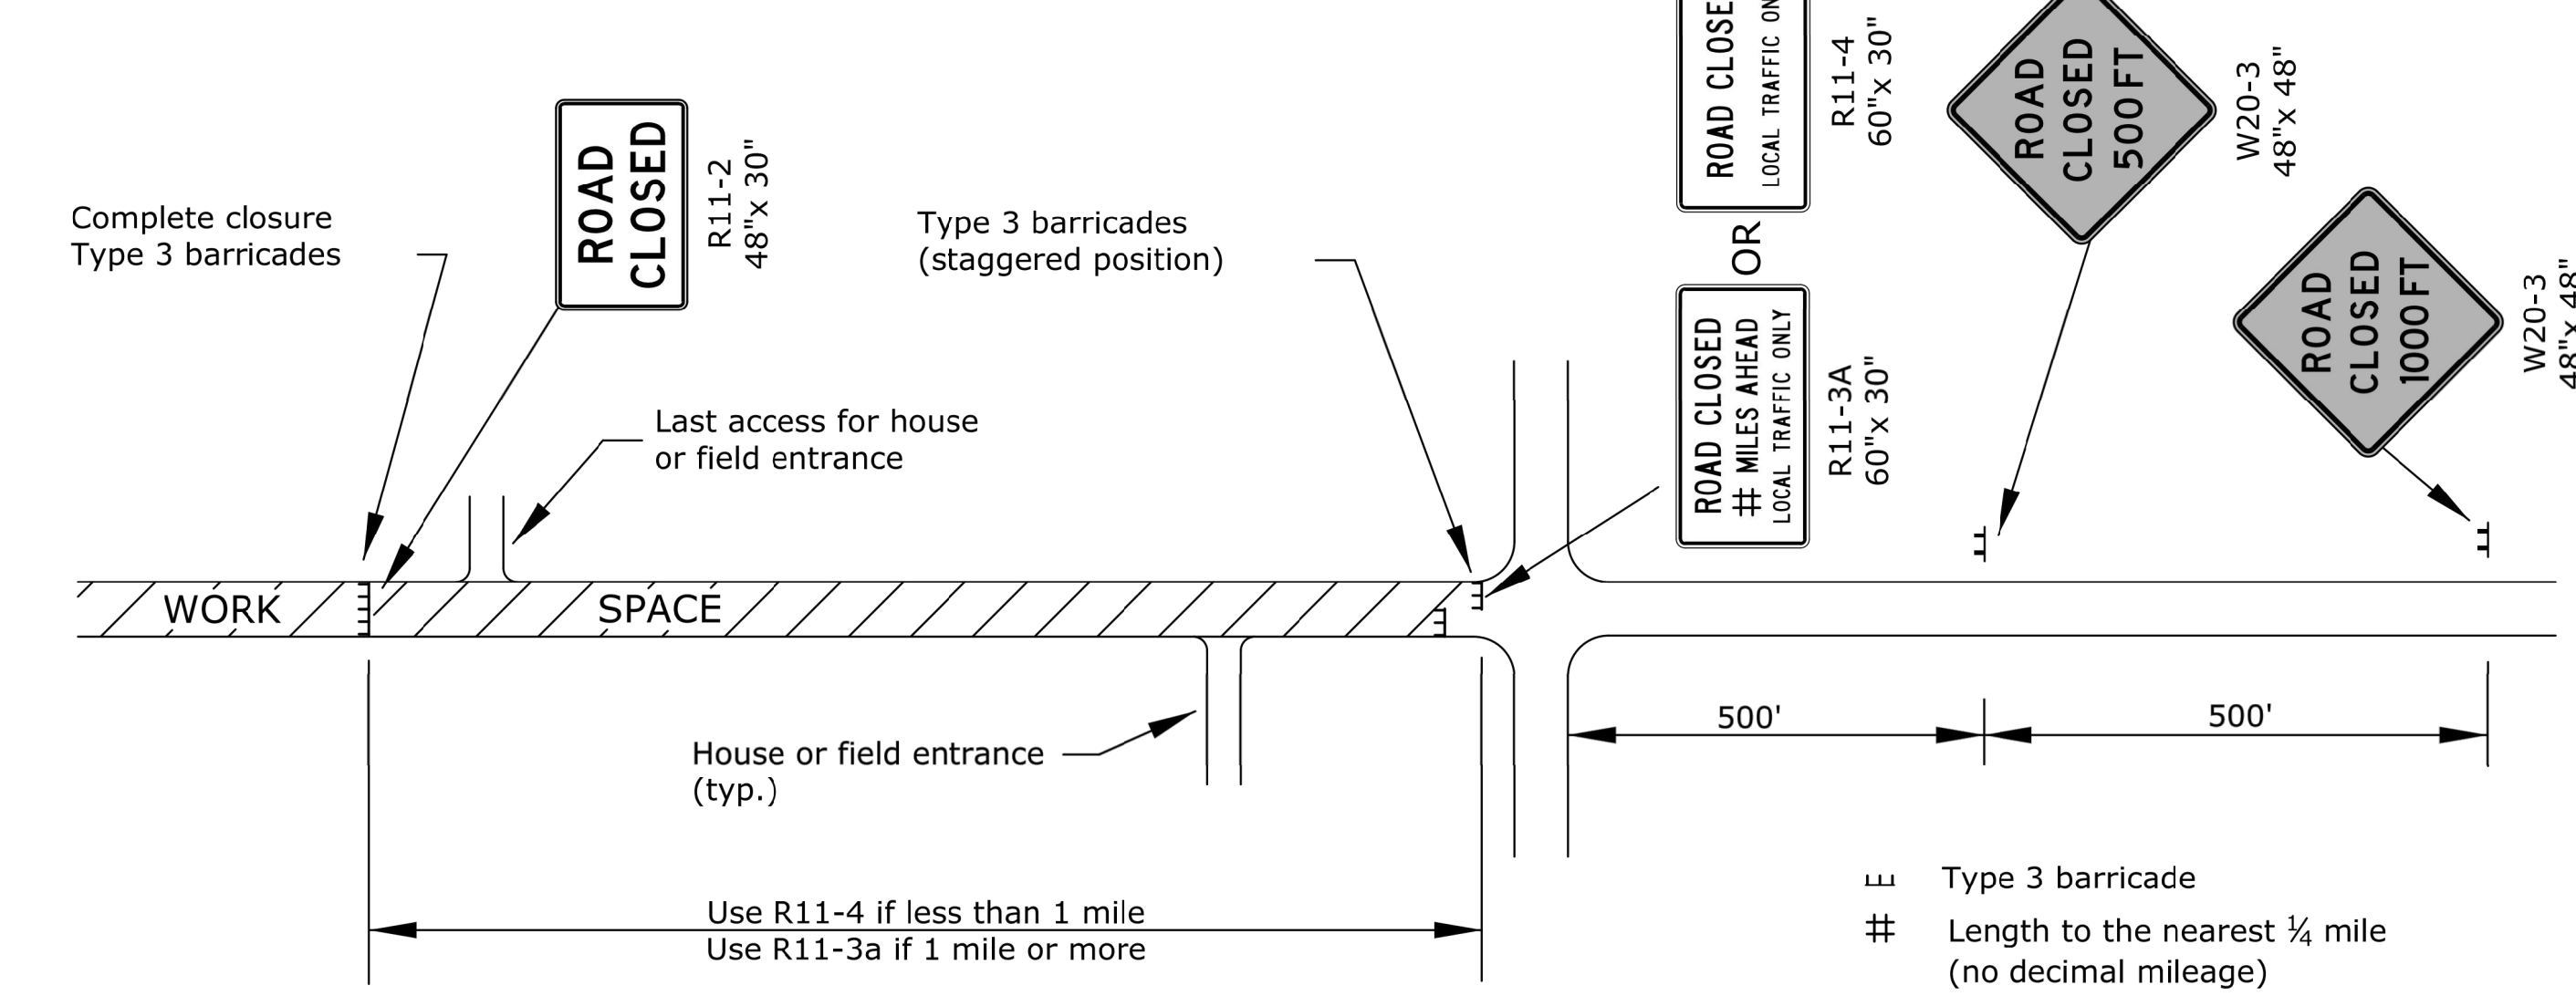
TYPICAL SIGNING FOR ROAD CLOSURE - LOCAL TRAFFIC ACCESS
